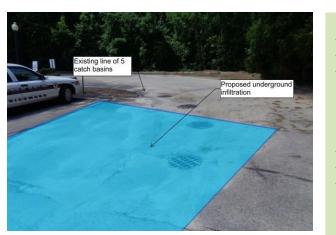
View of proposed underground infiltration area and existing catch basins adjacent to Main Street and the front of the police station.
